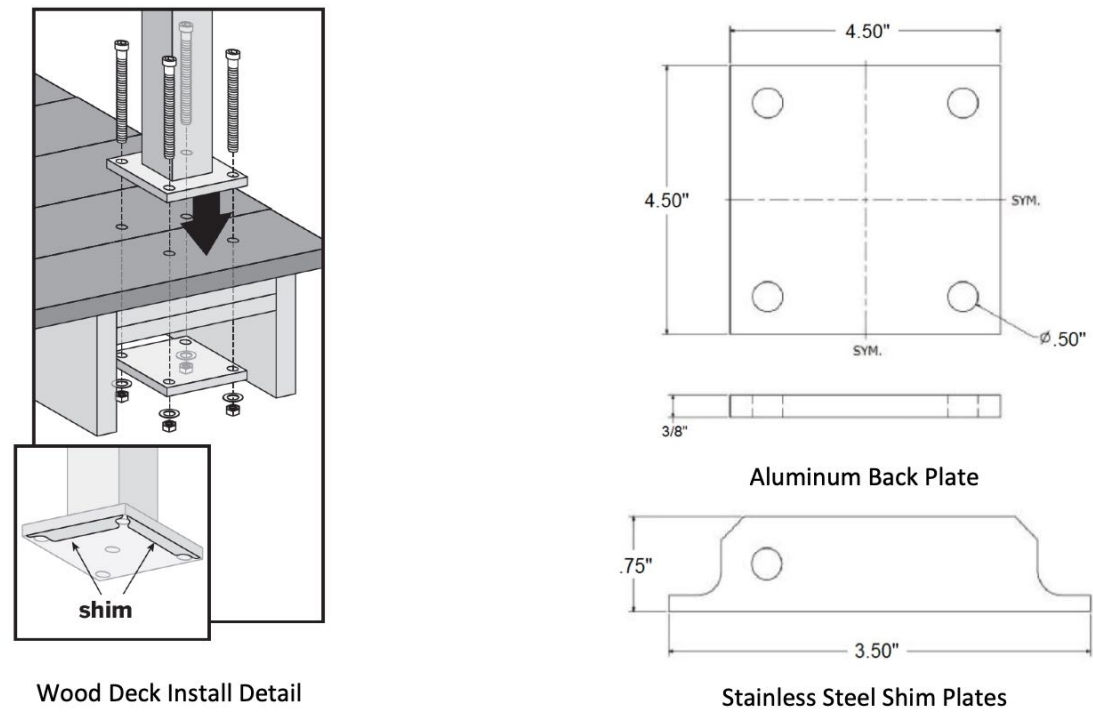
POST MOUNT INSTALLATION ON WOOD DECK
